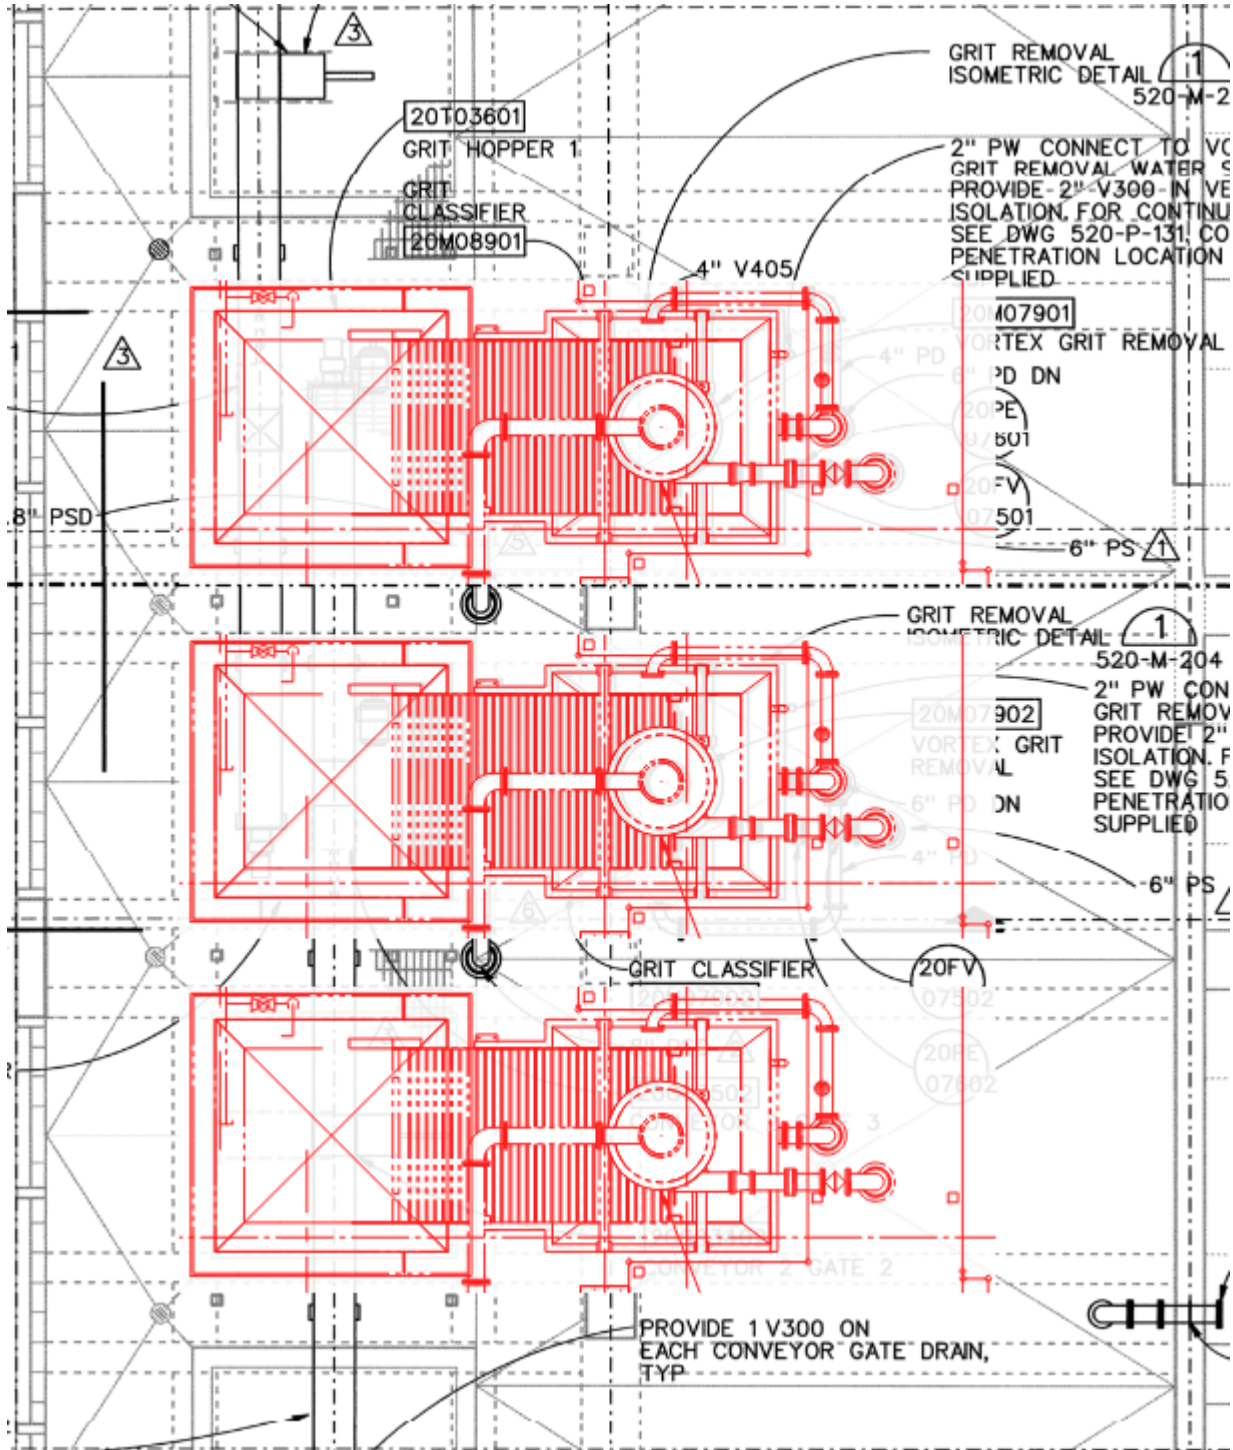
Alternative 1 - Slurry Cup/Snail Layout
